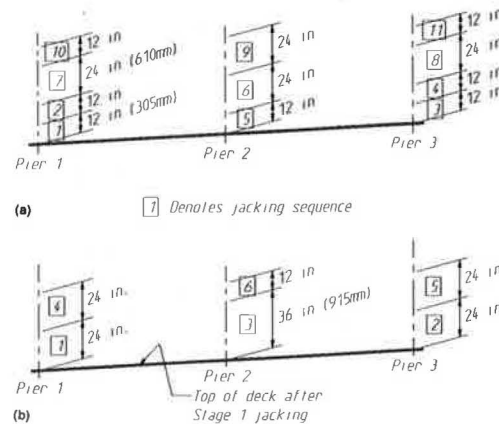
Jacking (a) Stage 1, and (b) subsequent stages.
